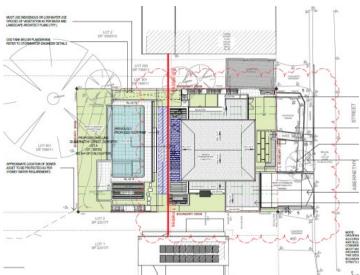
Extract of plans showing the alignment of the building relative to the two adjoining buildings.
